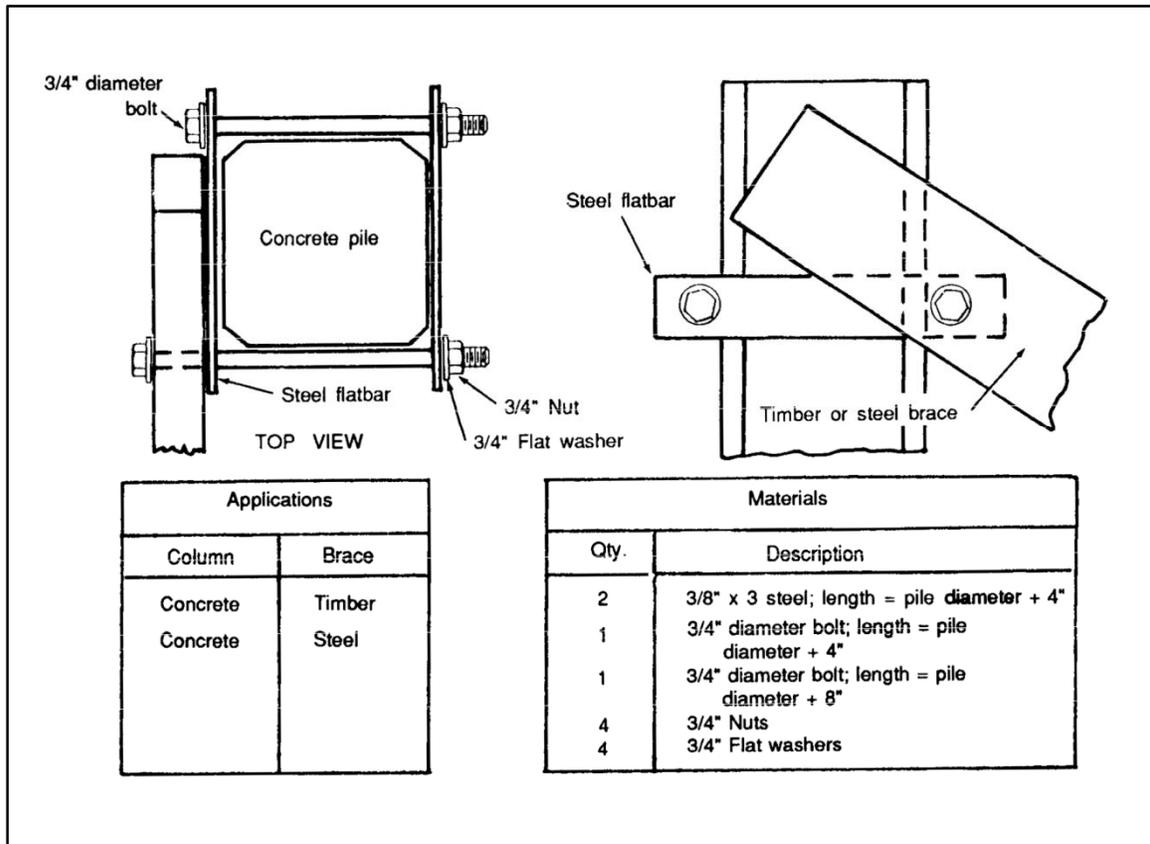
Brace connected to concrete pile (external bracket-bracing method 3)
